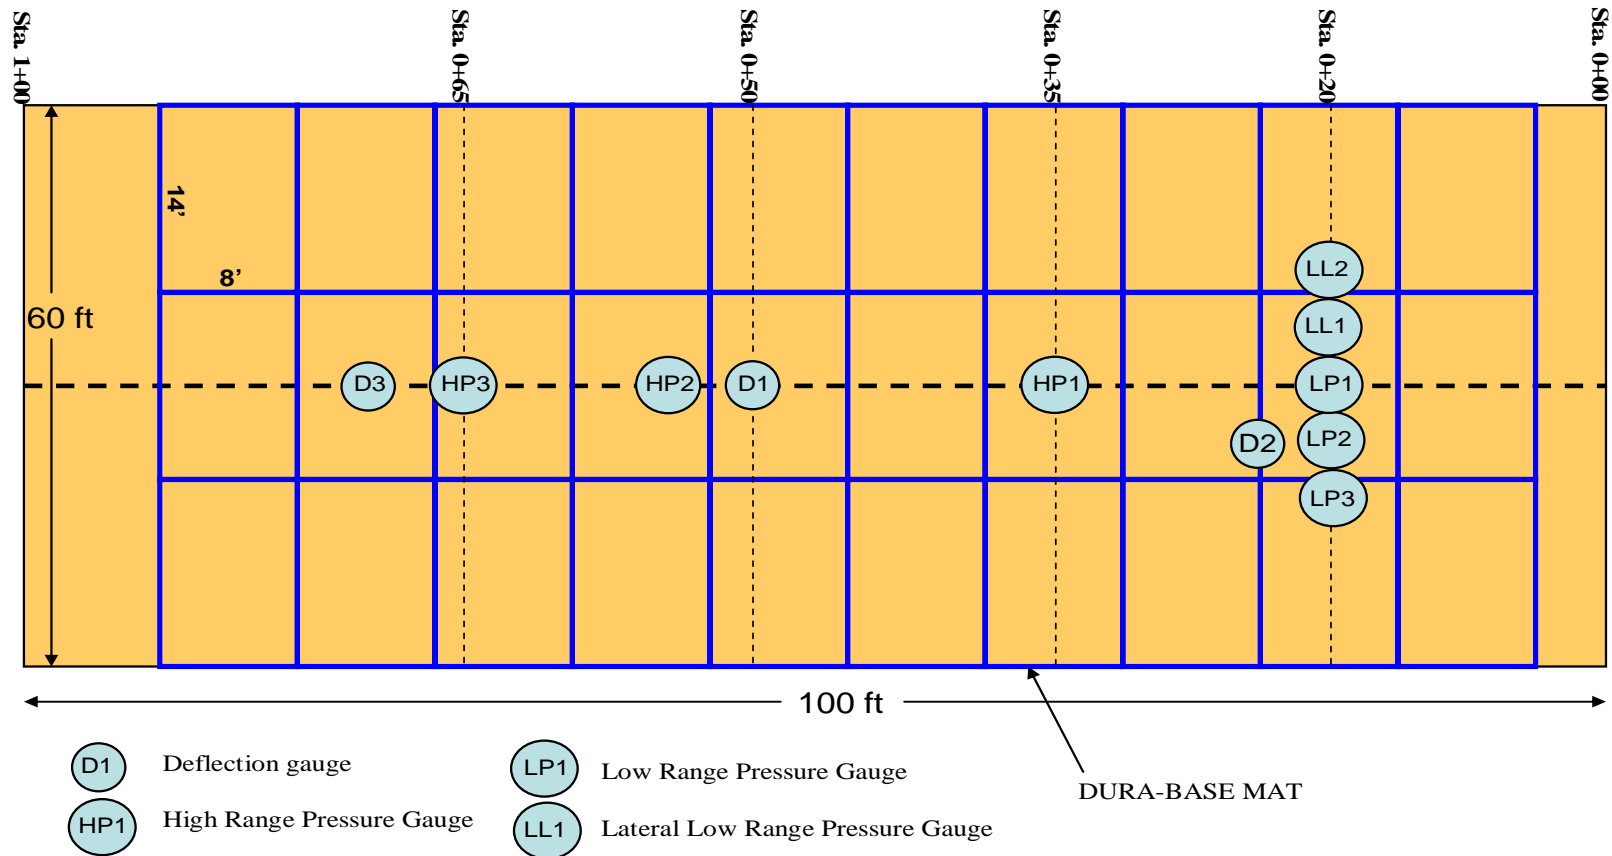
Test Section/Instrumentation Layout – DURA-BASE® Mat System – Silty Sand Test Section
